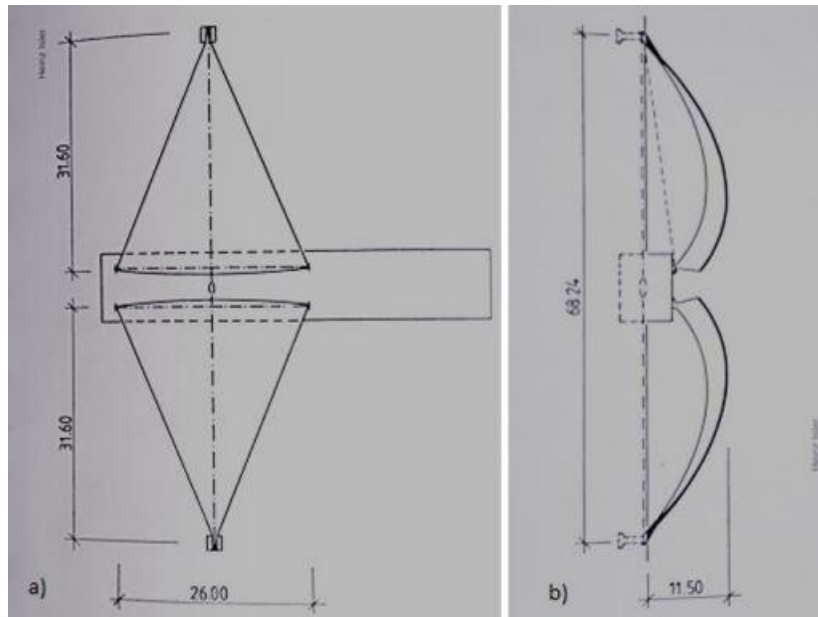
(a) The plan of the shell structures in Deitingen (b) Elevation (Chilton, 2000)
